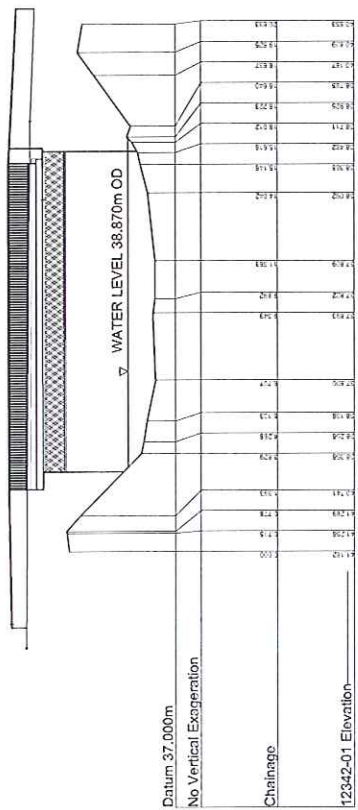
A Mullagh Bridge Proposed Works
